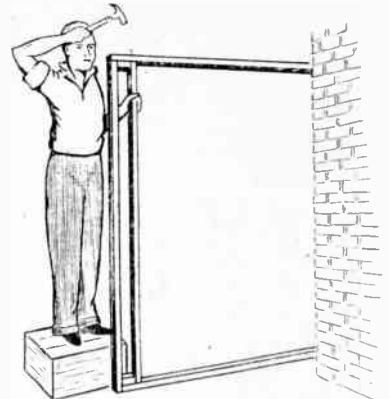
Second stage with 3½ in. spacing pieces being nailed in
